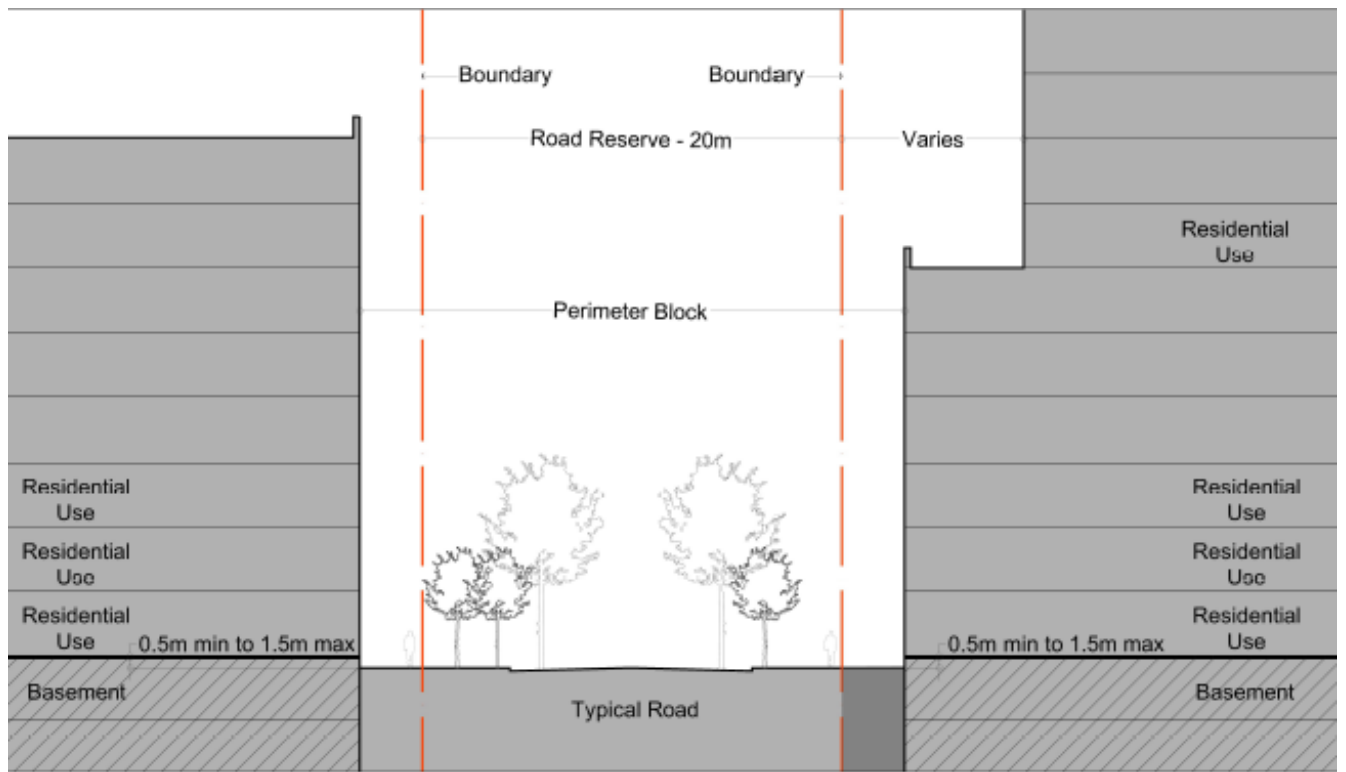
Street Wall Height at Typical East West Street, NTS
